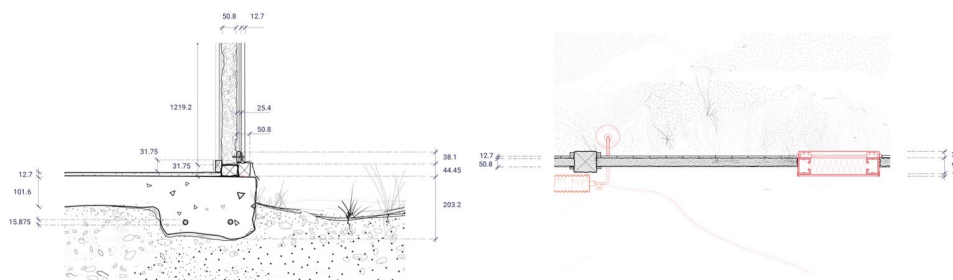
Stramit wall section and proposed juxtaposition of contemporary wall section (in red)
